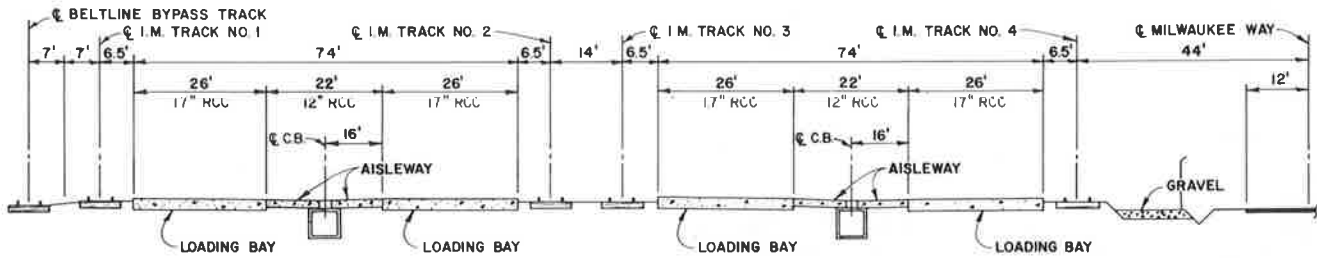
Typical yard section—South Intermodal Rail Yard.
